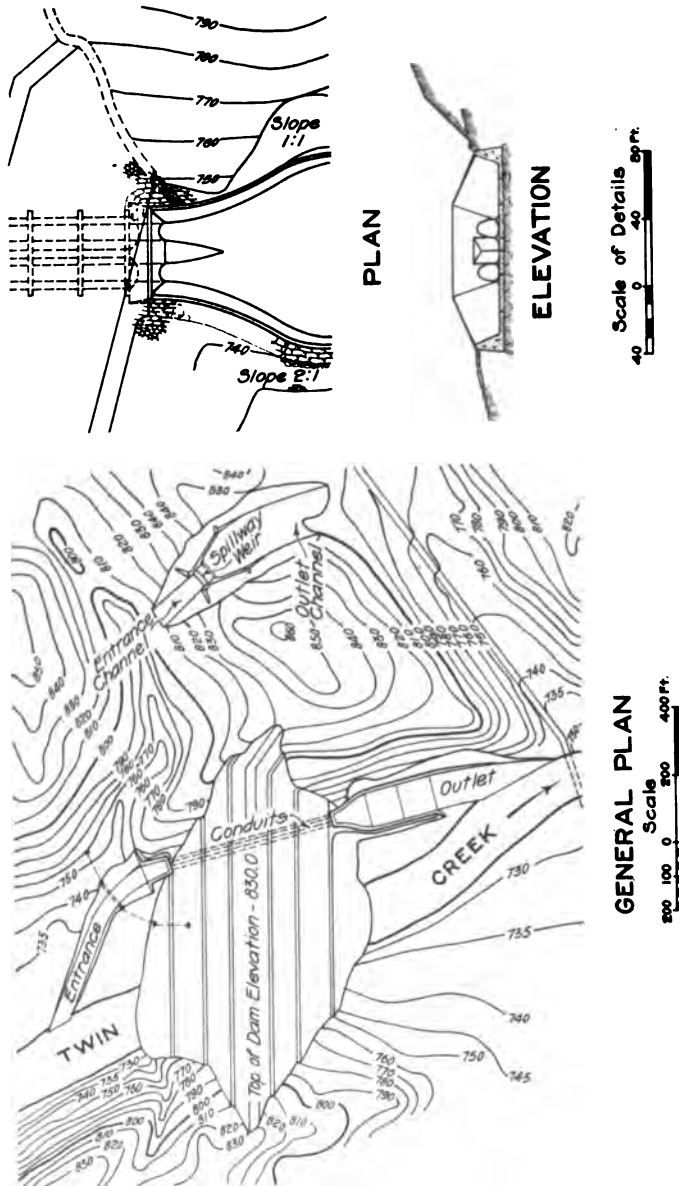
GENERAL PLAN OF GERMANTOWN DAM, OUTLET CONDUITS, AND SPILLWAY; AND ENLARGED PLAN AND ELEVATION OF LOWER END OF OUTLET WORKS.
